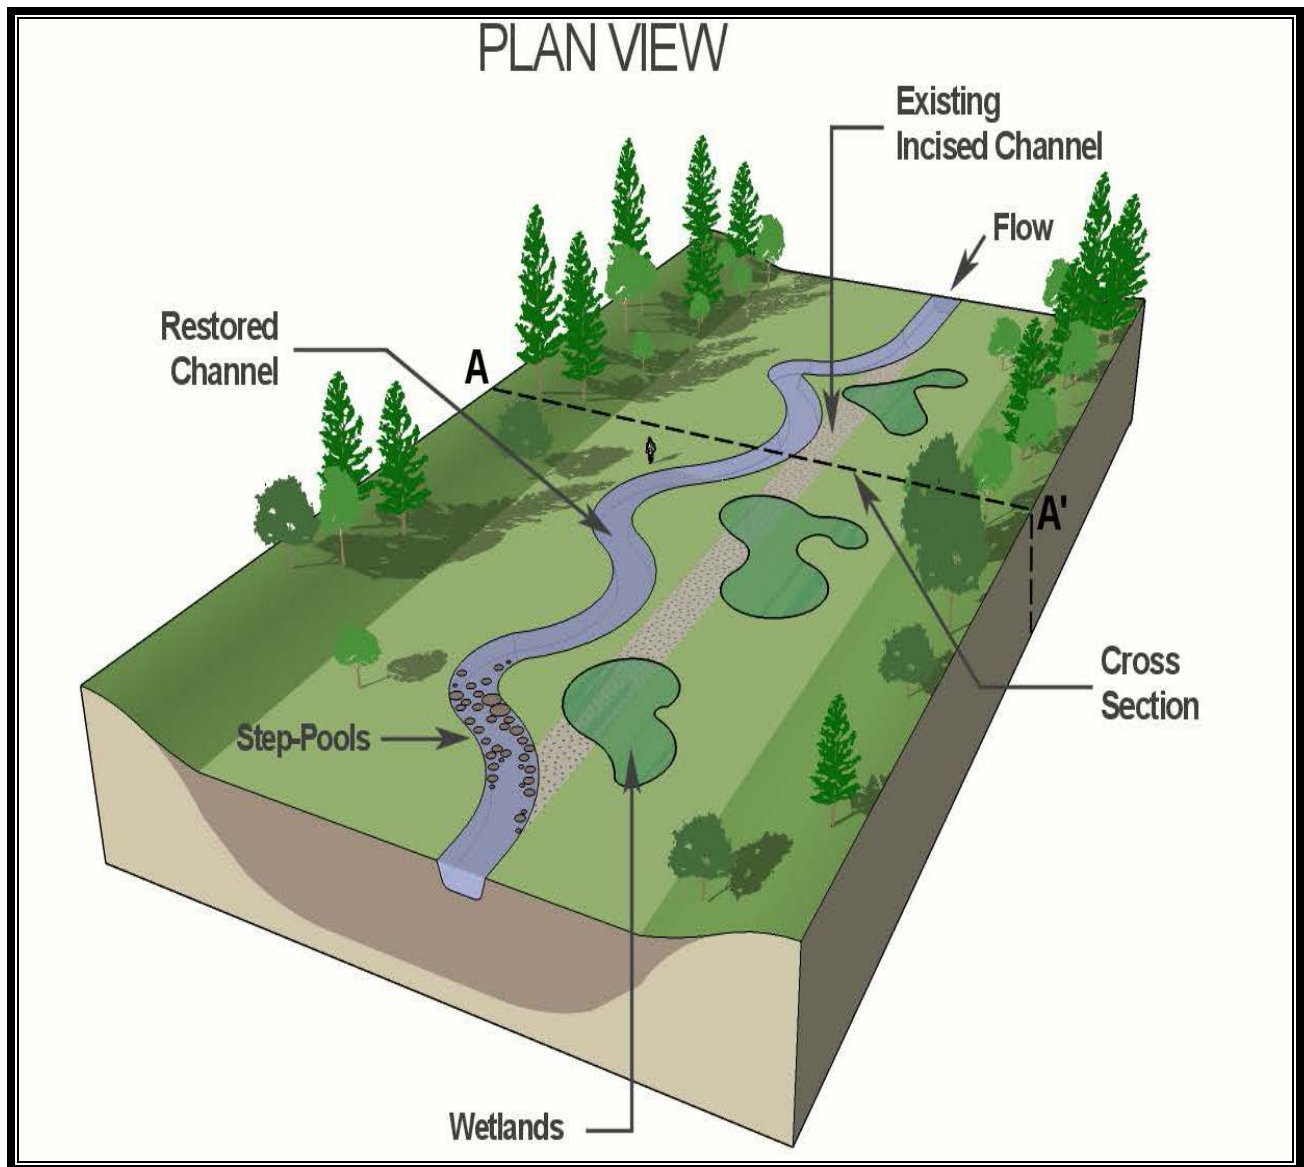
P1-FLOODPLAIN RECONNECTION APPROACH-PLAN VIEW
